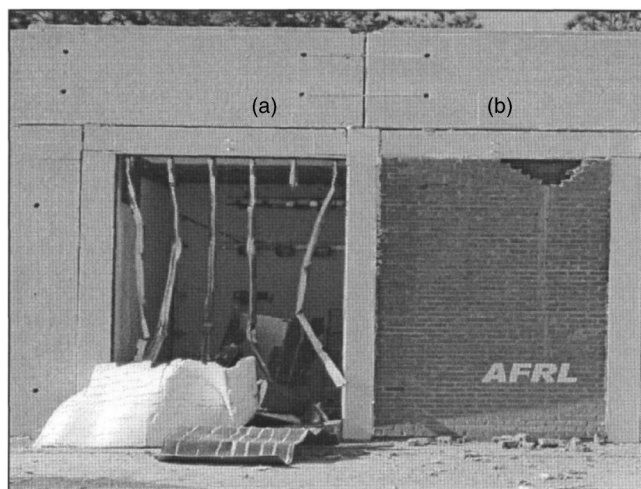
Posttest exterior views of BREW-1: (a) external installation and finish system façade; and (b) brick façade
